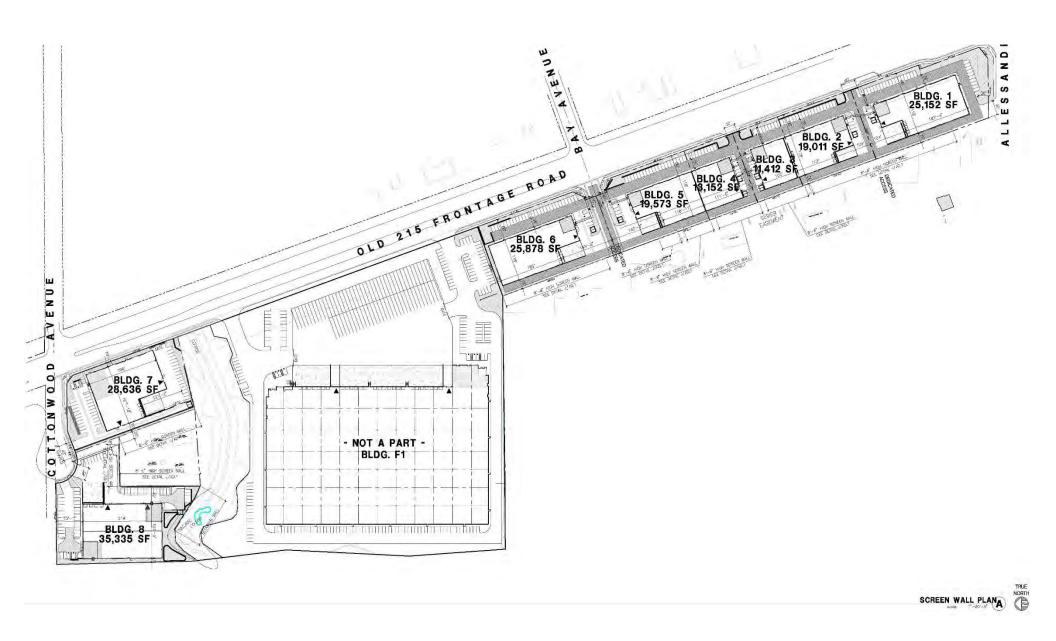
Project Plans (Conceptual Landscape Plan)
